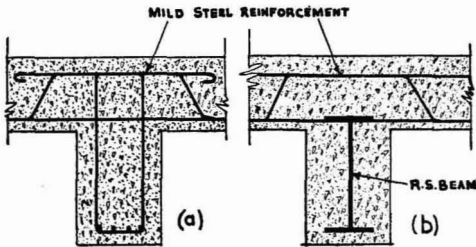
(a) RC beam and RC slab design; and (b) steel beam and RC slab design
